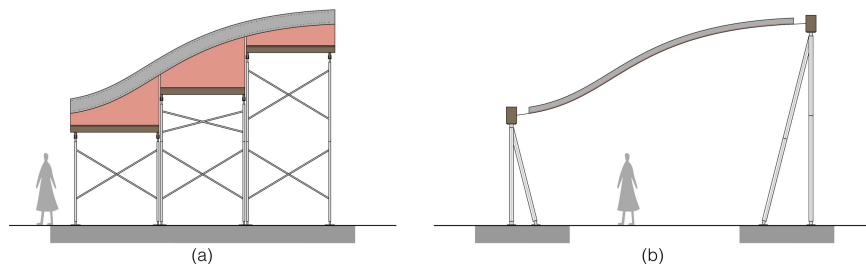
Principle representation of rigid and flexible formwork systems: (a) traditional rigid formwork system; (b) flexible formwork system using a textile.
